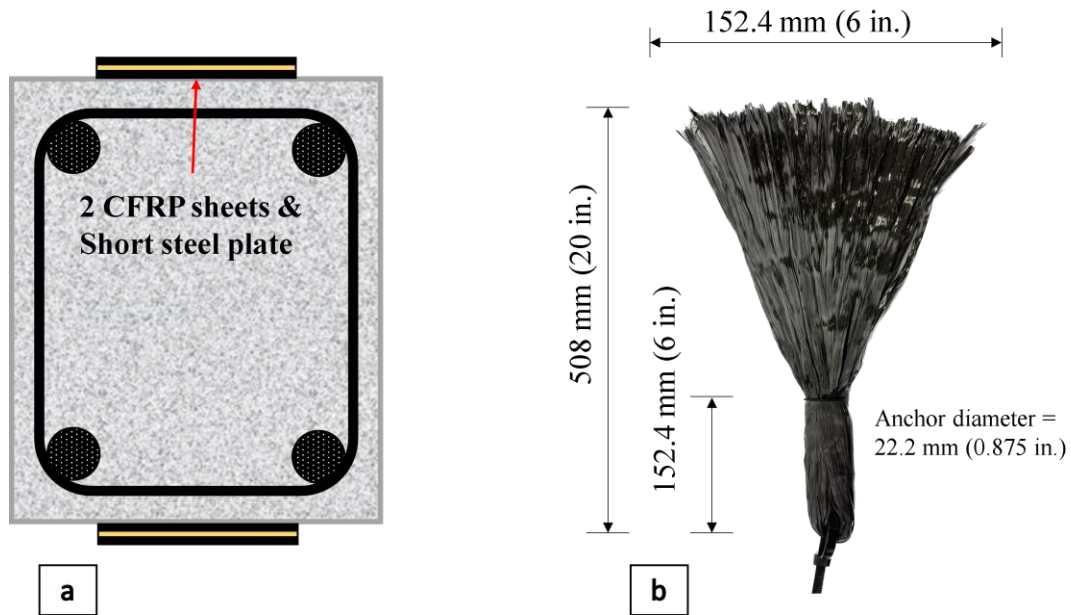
Cross section of beam No.7, beam No.16, and the carbon fiber anchor.
